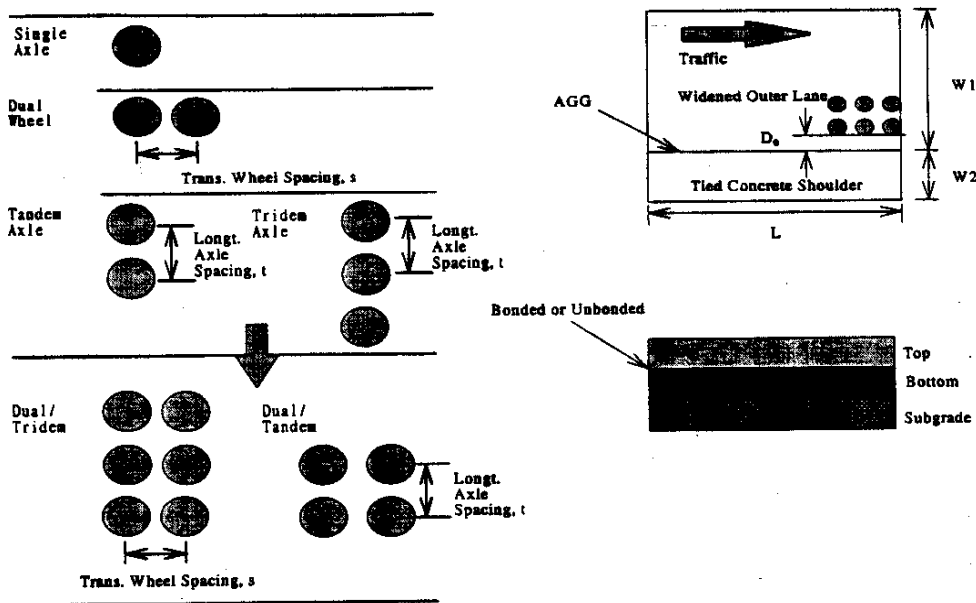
Various Loading Conditions of Jointed Concrete Pavements
